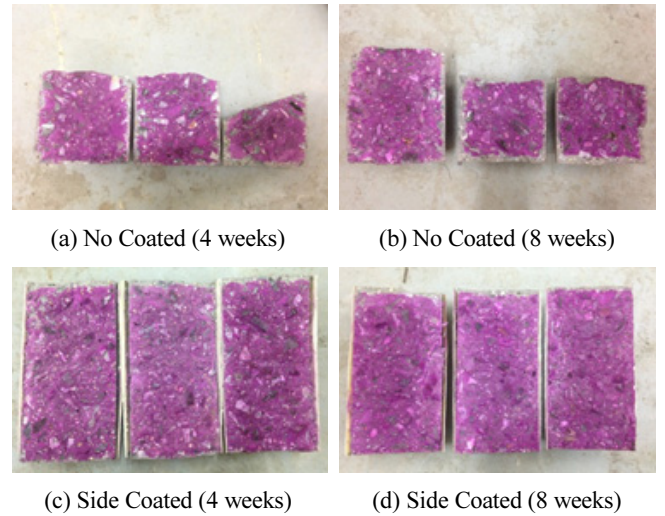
Concrete carbonation exposure rest result (high strength concrete)
